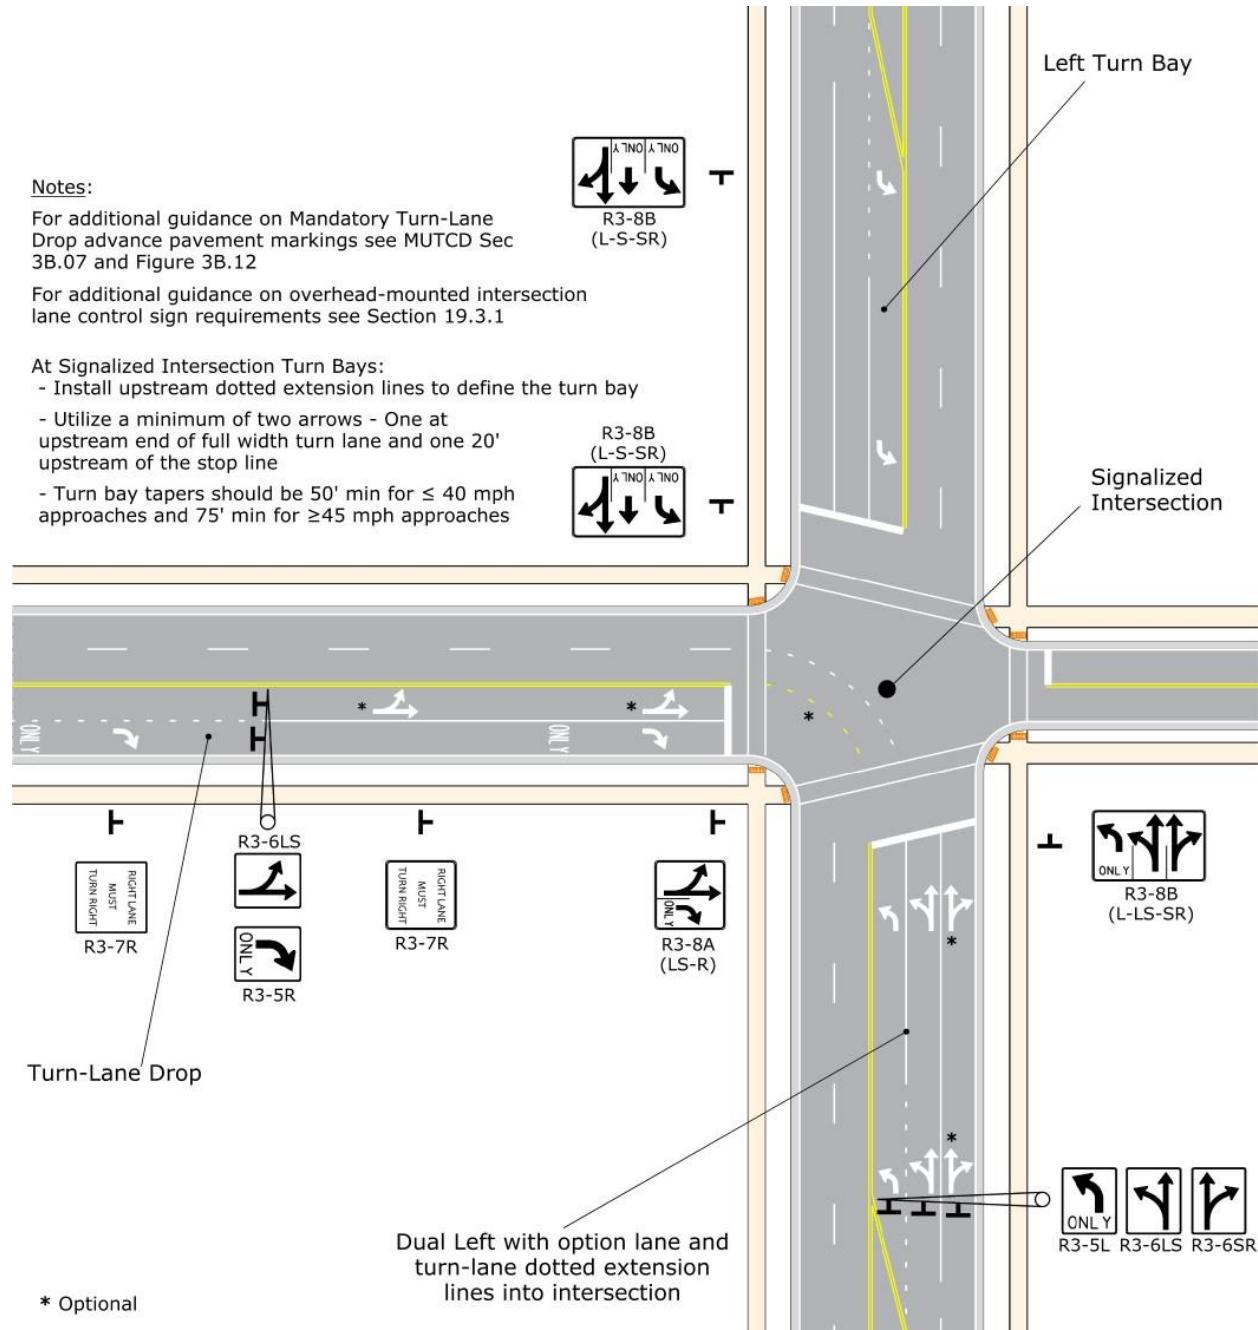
Pavement Markings for Signalized Intersection Two Approach Lanes – Typical Configurations Encountered
